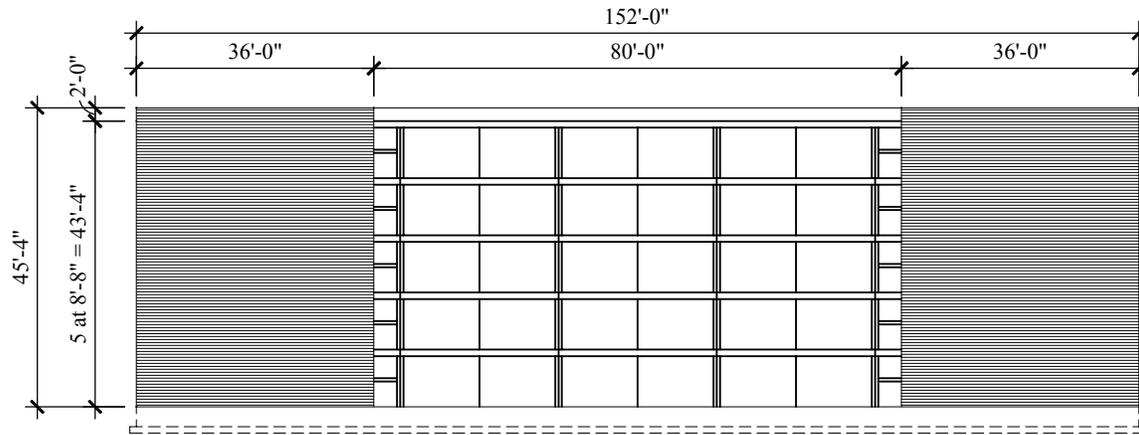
Building elevation (1.0 in = 25.4 mm, 1.0 ft = 0.3048 m).
